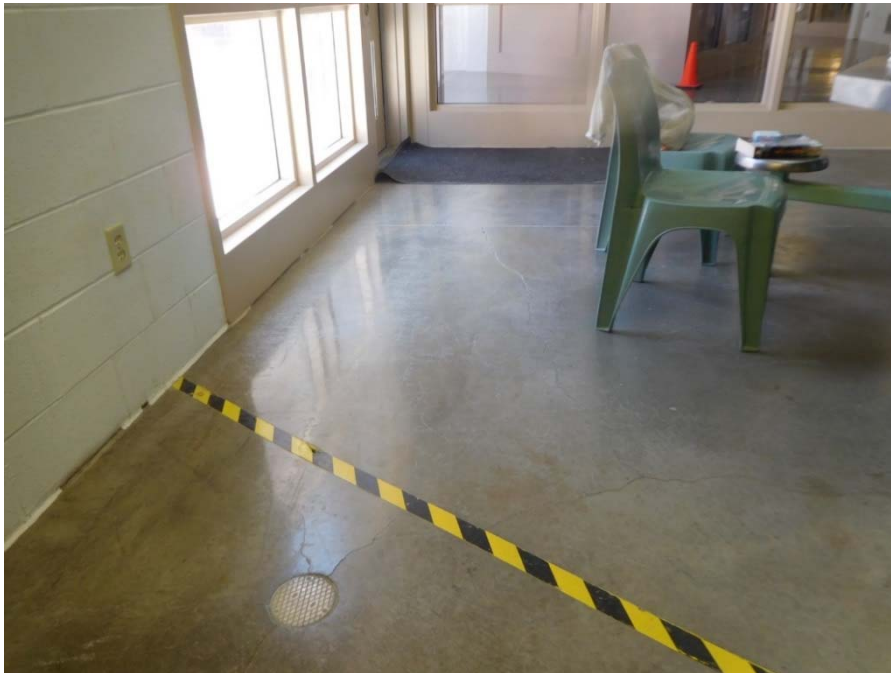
B. Masonry distress at window opening in north wall of Room A164.
